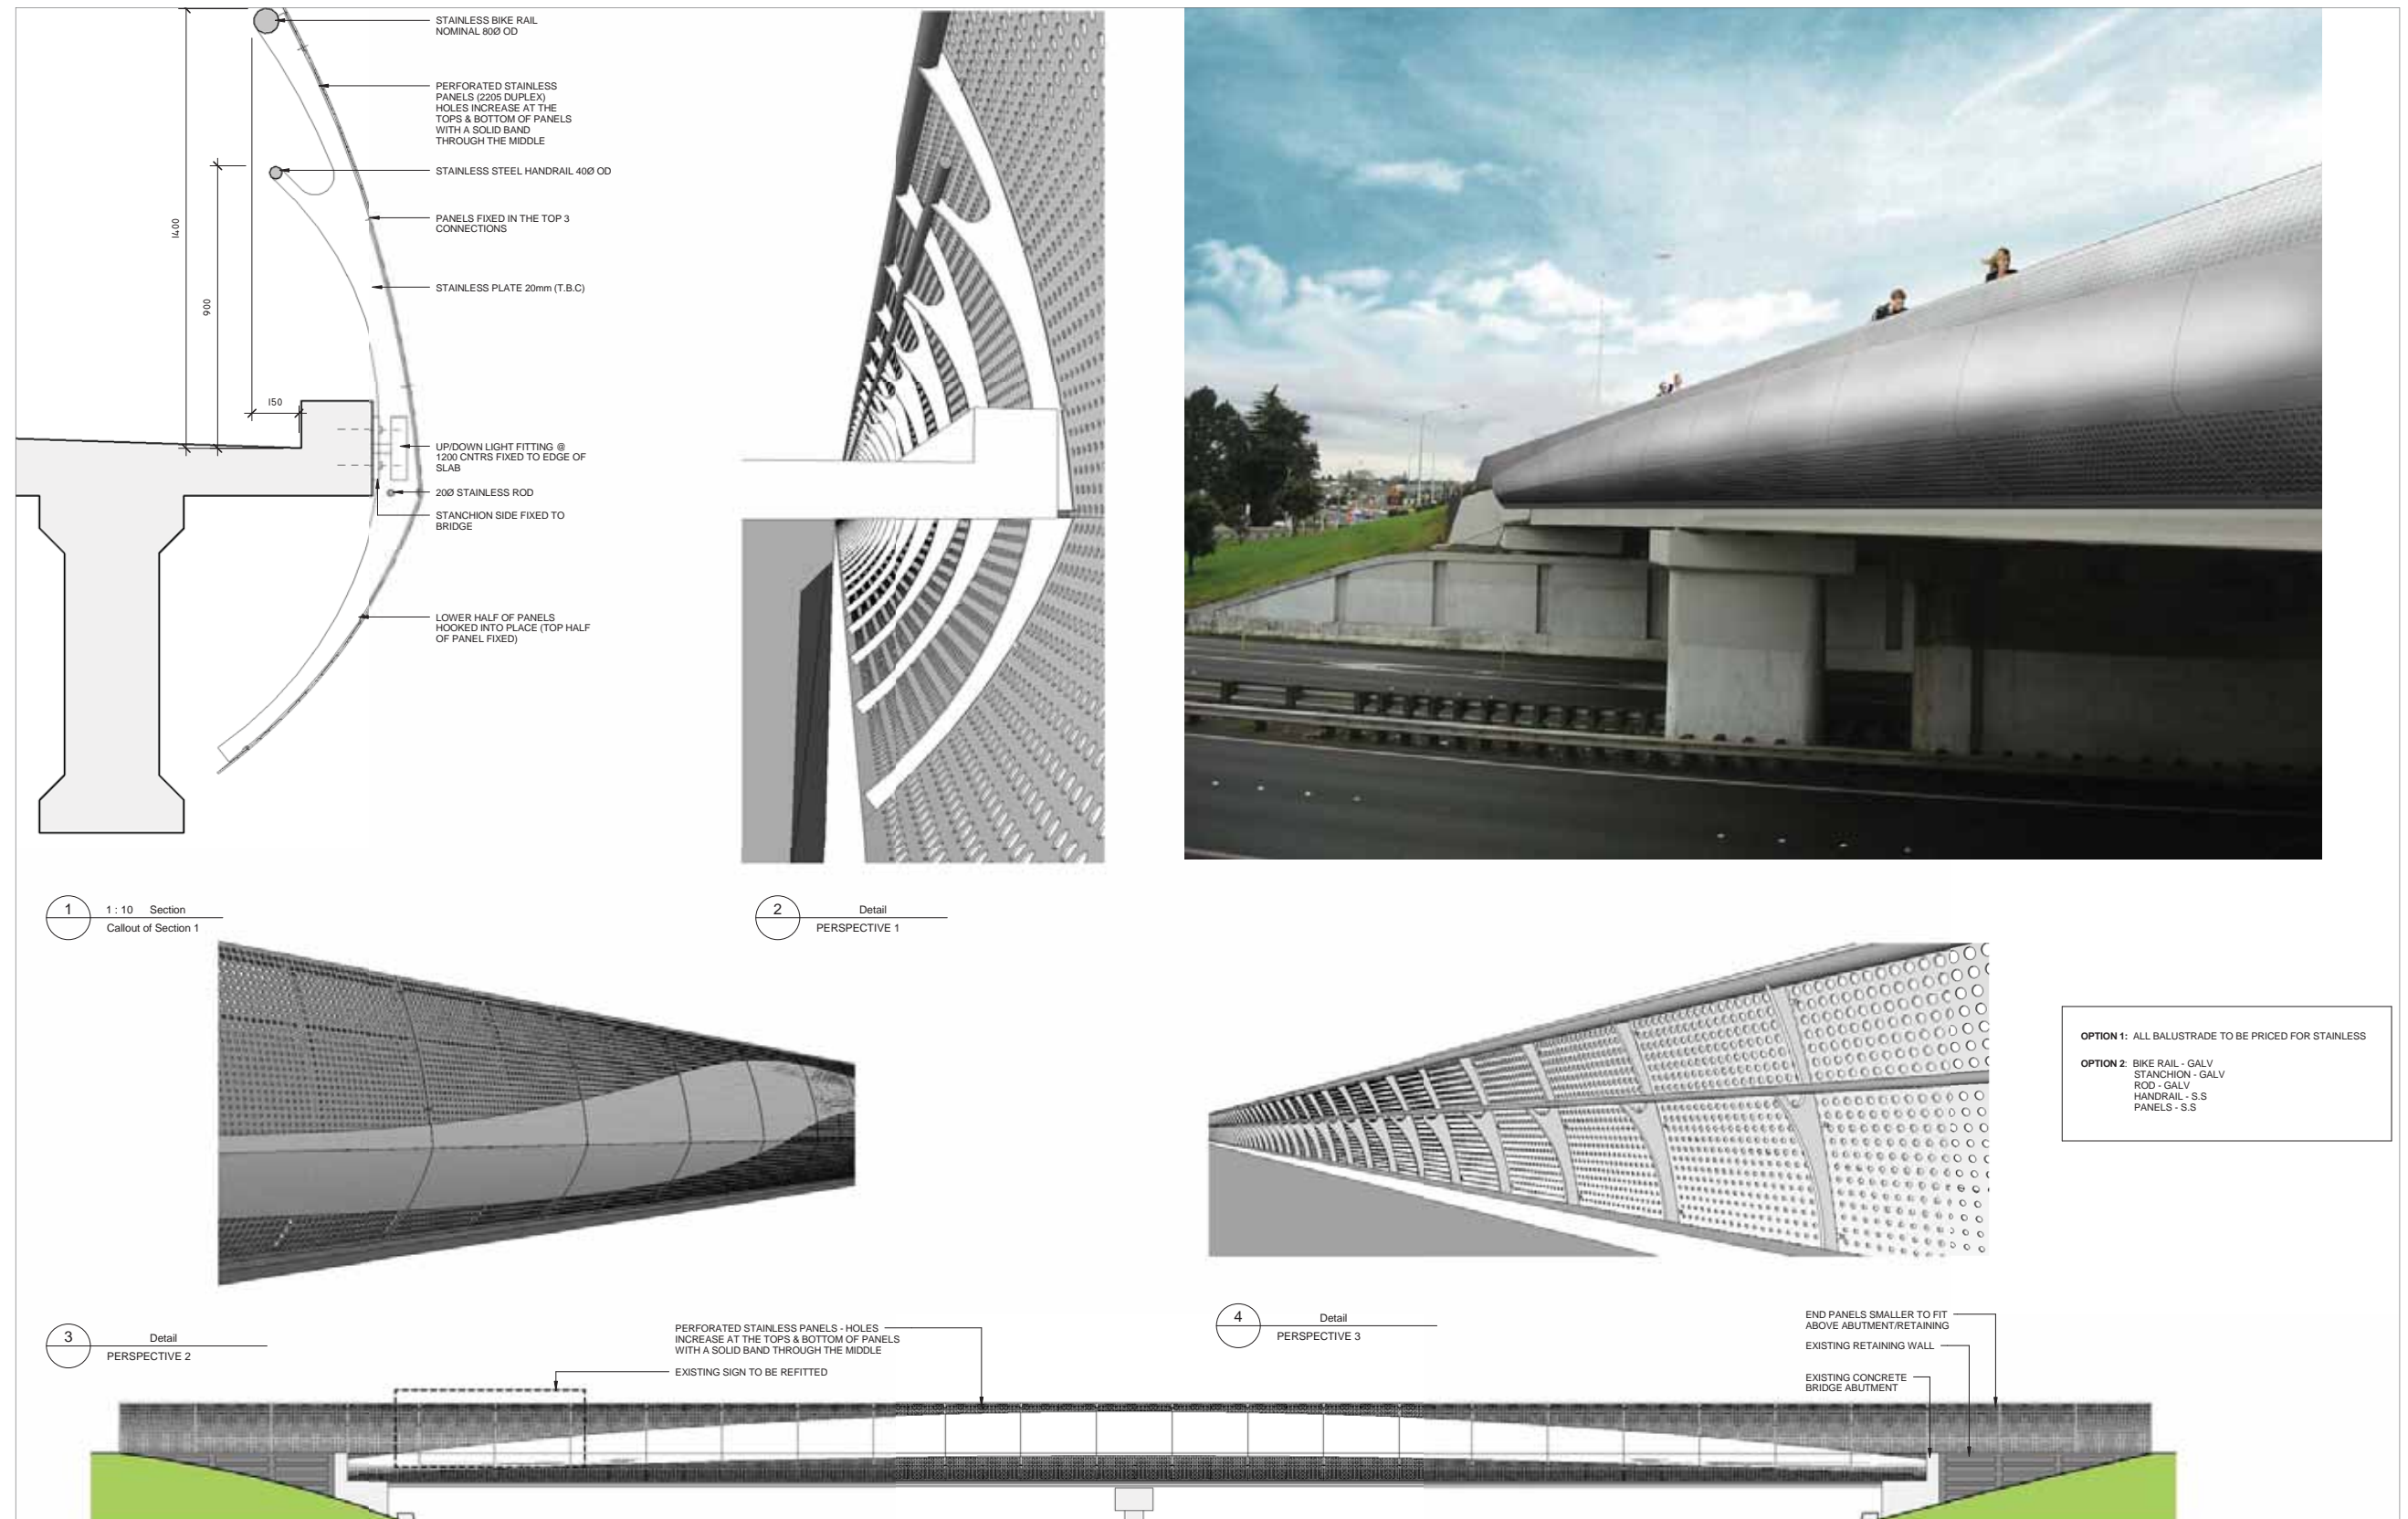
Bridge balustrade concept – detail for Te Atatu Road bridge
